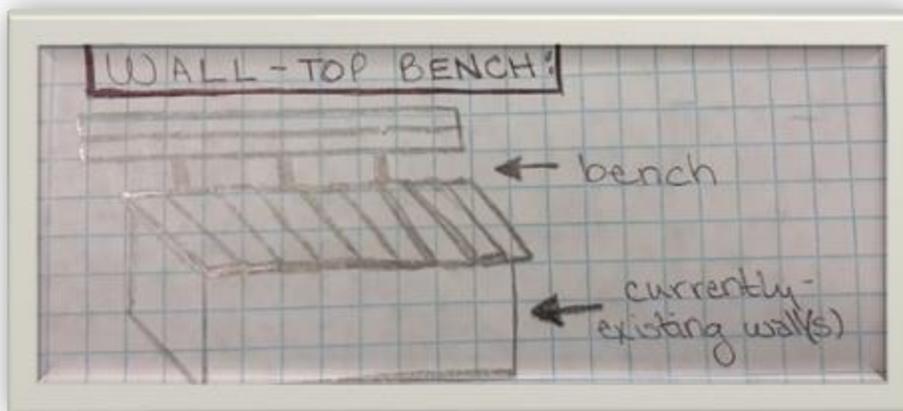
A wall-top bench diagram. By India Eichelbaugh-Goss.
